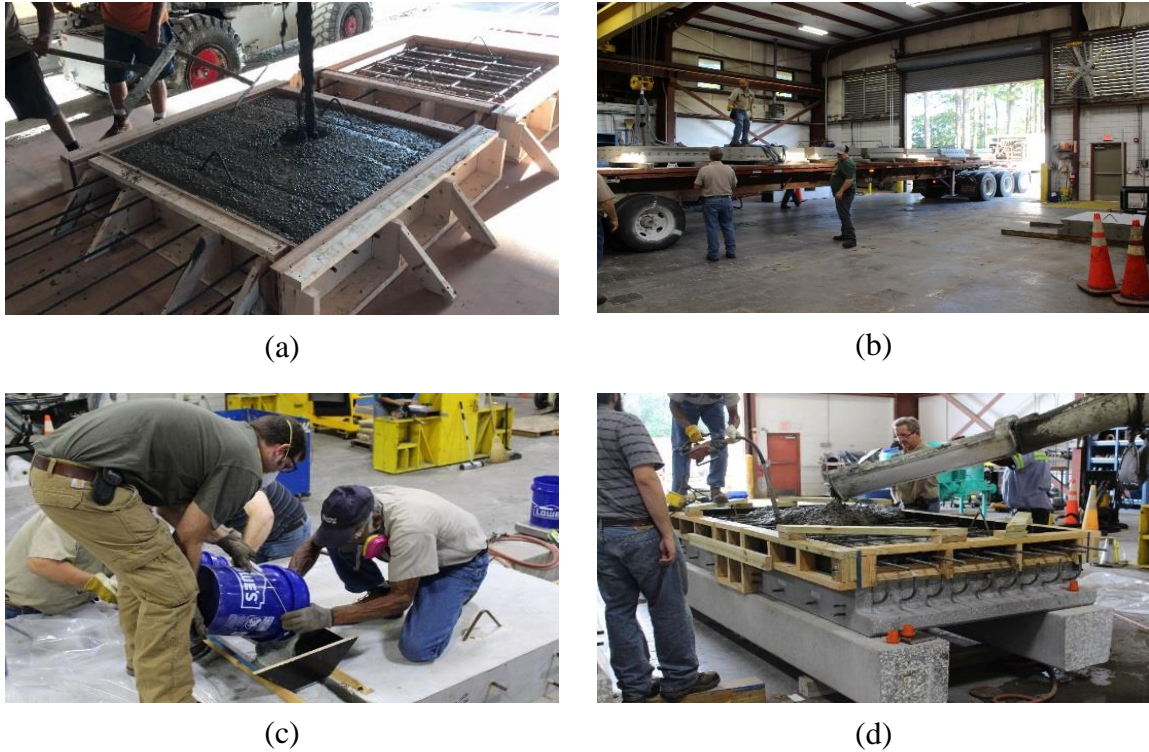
Construction of joint specimens: (a) precast specimen concrete pour, (b) delivery of slab-beam specimens to FDOT SRC, (c) casting of field-cast UHPC, and (d) FSB deck casting
